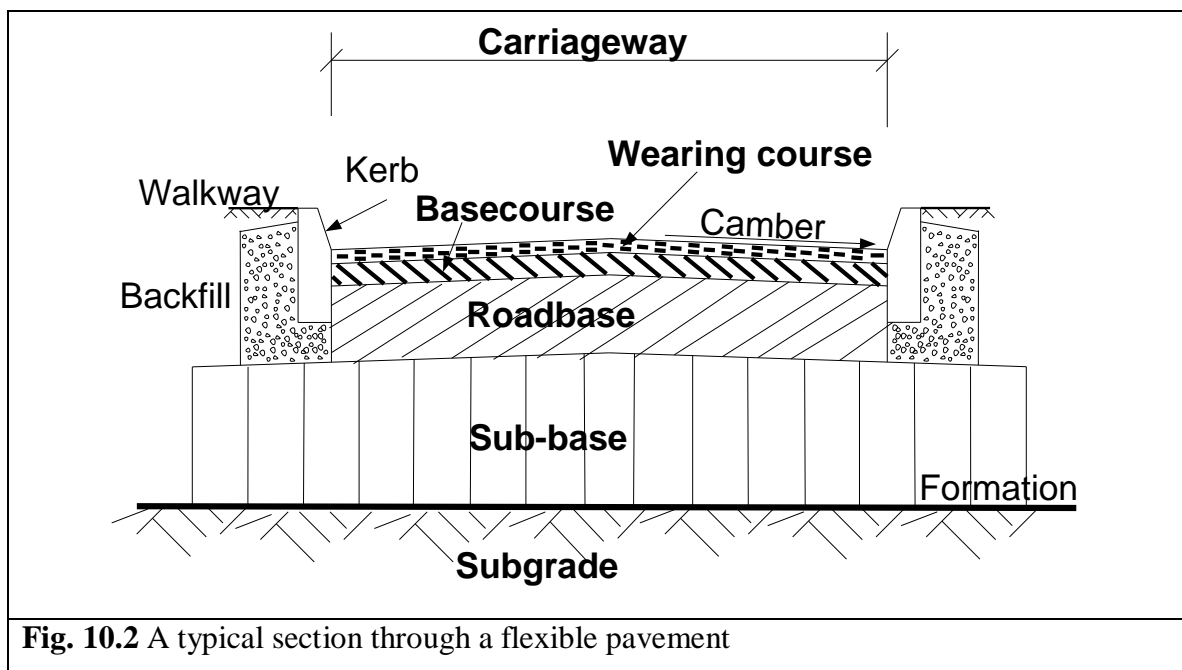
shows a typical cross section of a flexible pavement. The functions of the different layers of flexible pavement are as follows,
